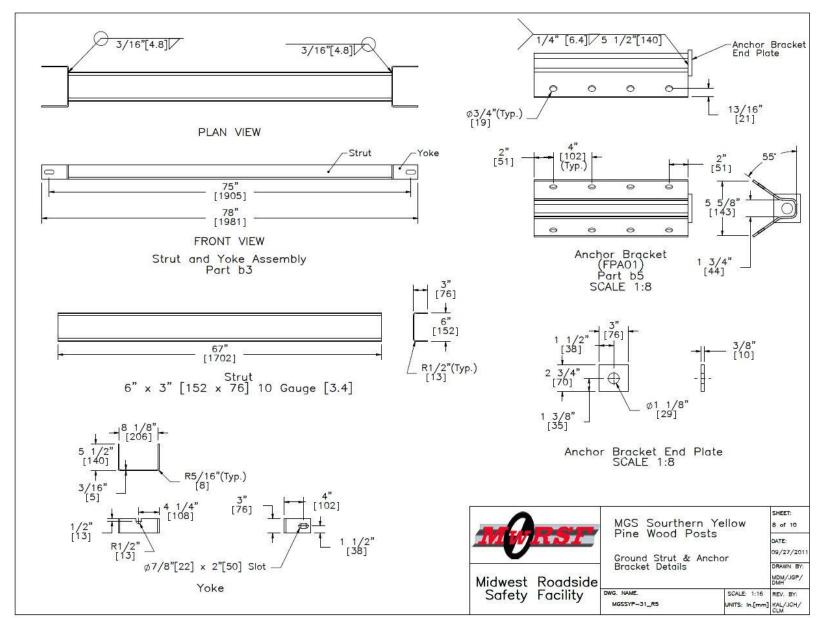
Ground Strut and Anchor Bracket Details, Test No. MGSSYP-1
